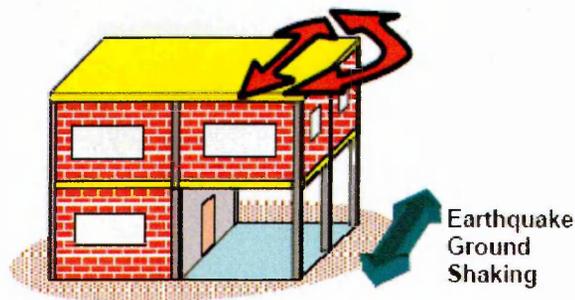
One-side open ground storey building twists during earthquake shaking (IITK-BMTPC, 2002)
